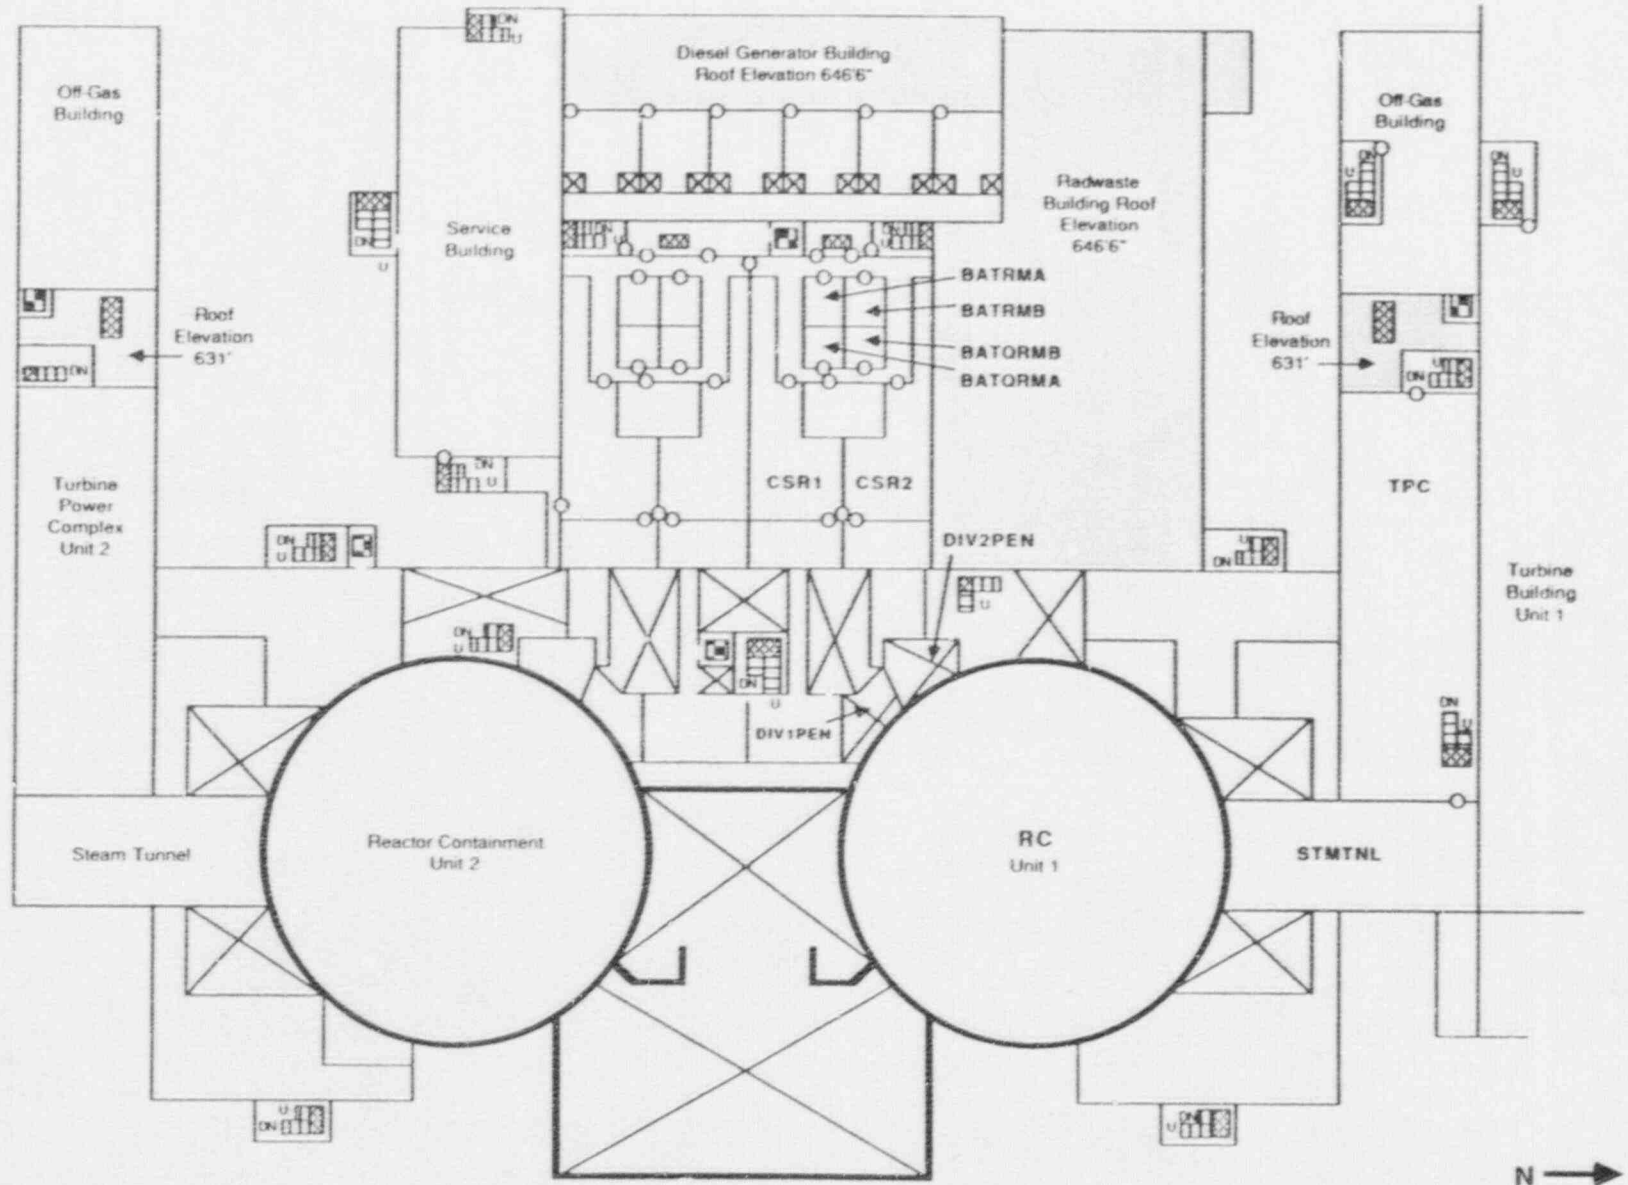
Perry 1 and 2 Reactor Building, Auxiliary Buildings, Intermediate Buildings Elevation 639'6", Control Complex Elevation 638', Turbine Power Complex Elevation 647'6", and Diesel Generator Building
